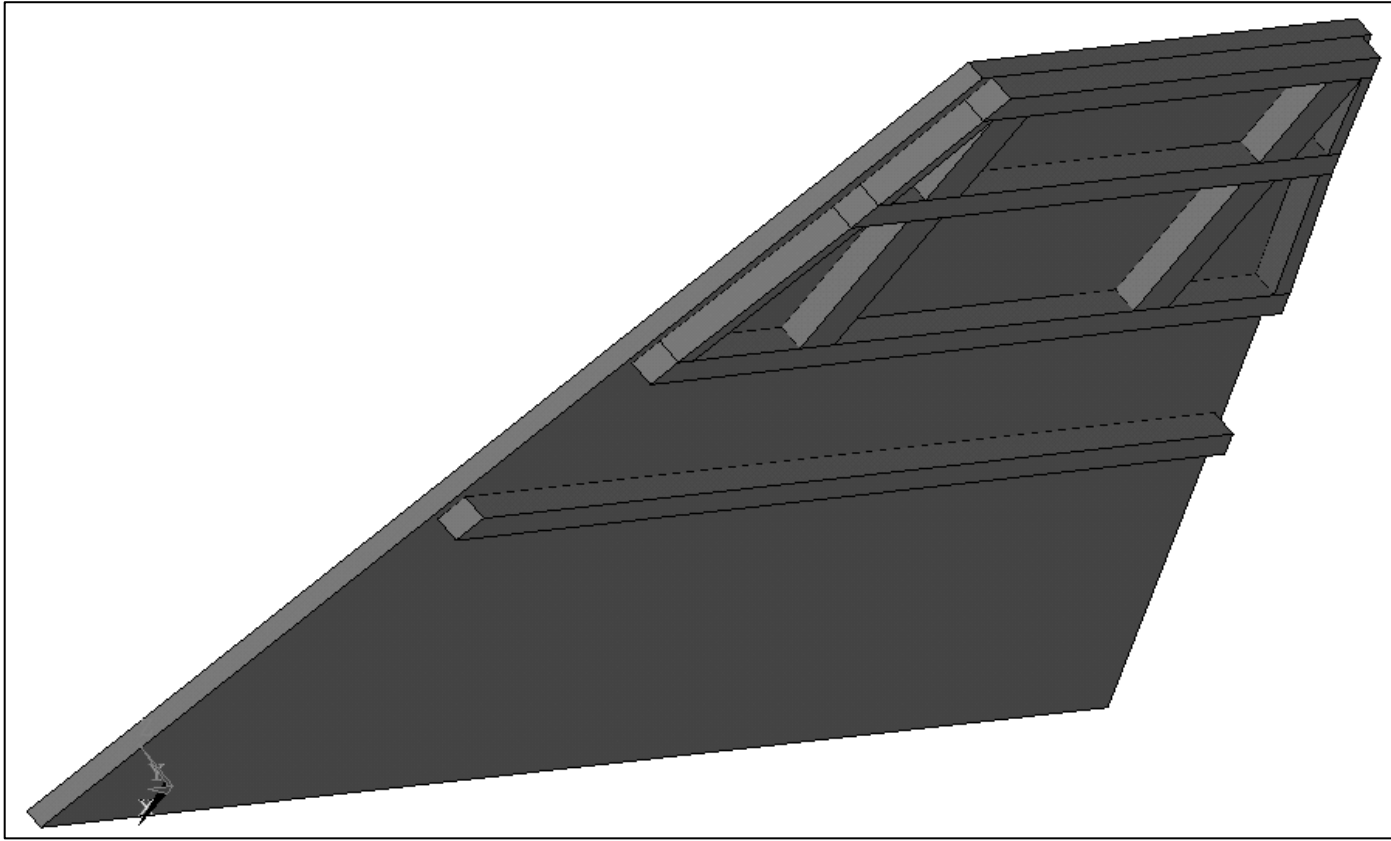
Pentagon Road Bridge Span 4 3D view
